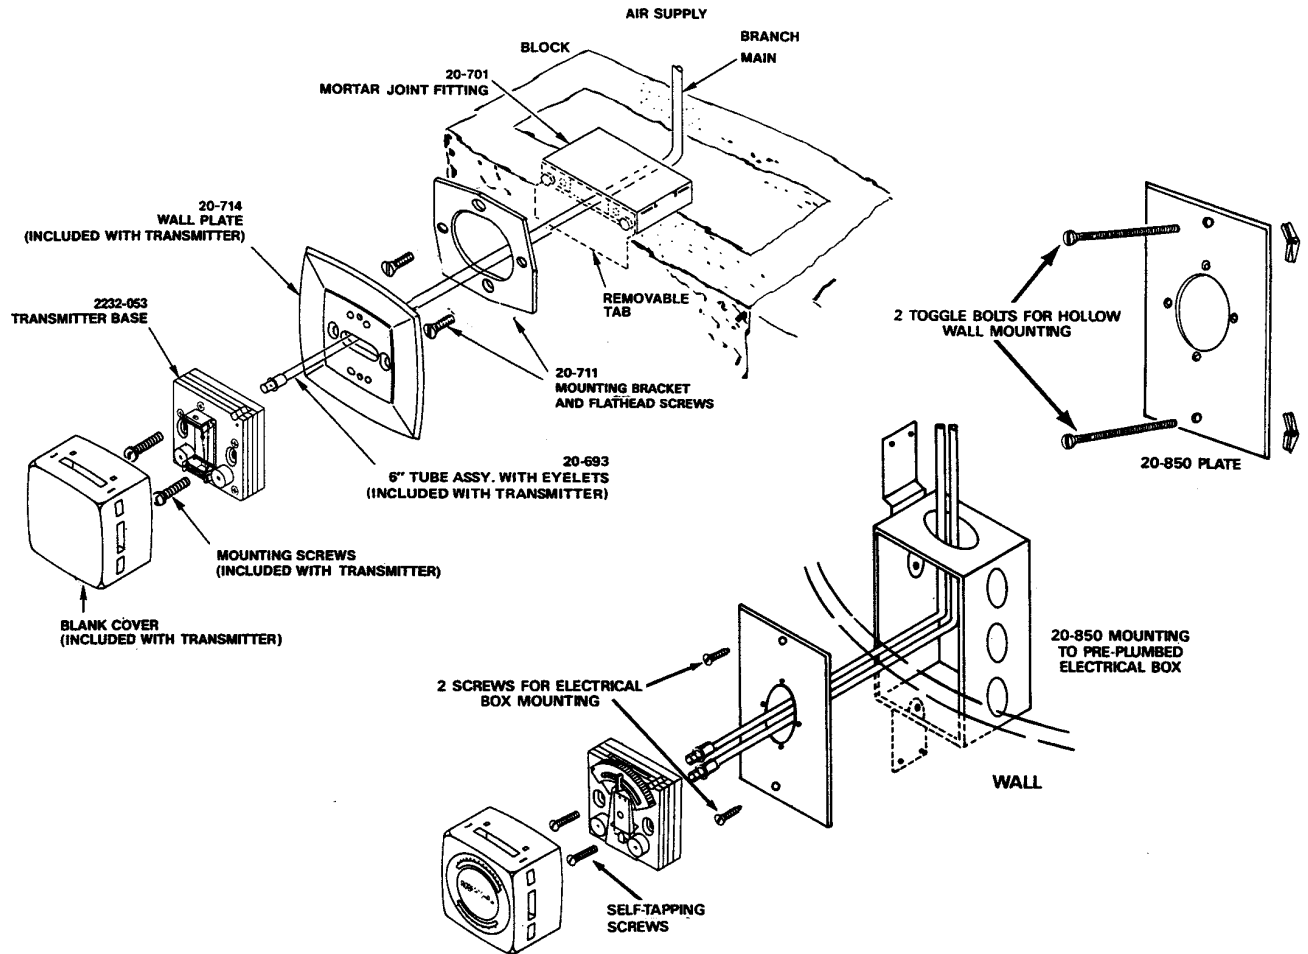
2232-053 Installation Using Mounting Box in Masonry Wall.
